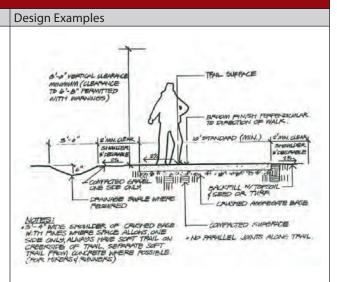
Recommended standard Greenway design. Additional details are contained in the Greenway Development Plan.
